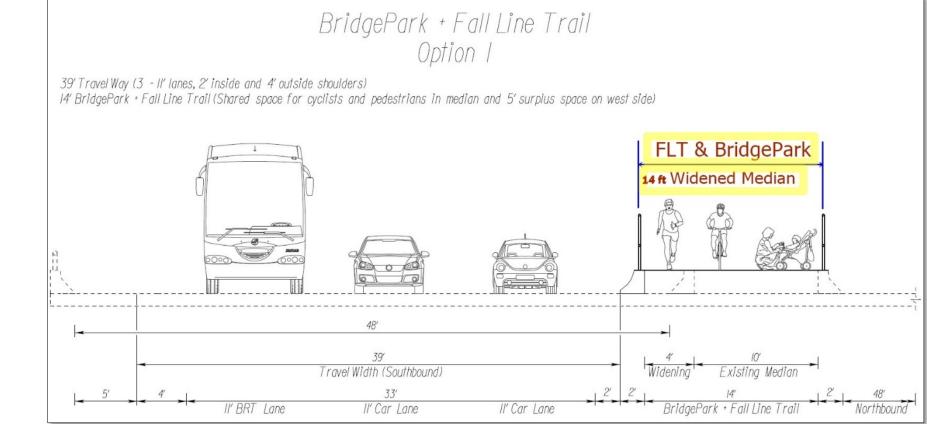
Bridge Section View of Option 1 submitted by BridgePark
